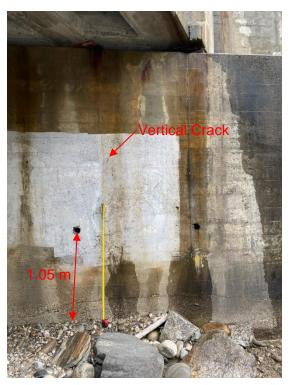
View looking south (downstream) at the west abutment foundation wall (Photograph by BGC taken on April 26, 2023).
